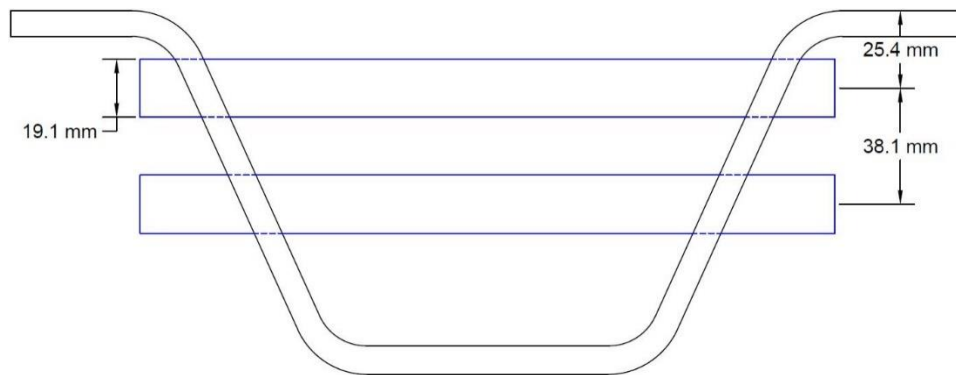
Section A-A of corrugated beam showing vertical spacing of shear transfer bars
